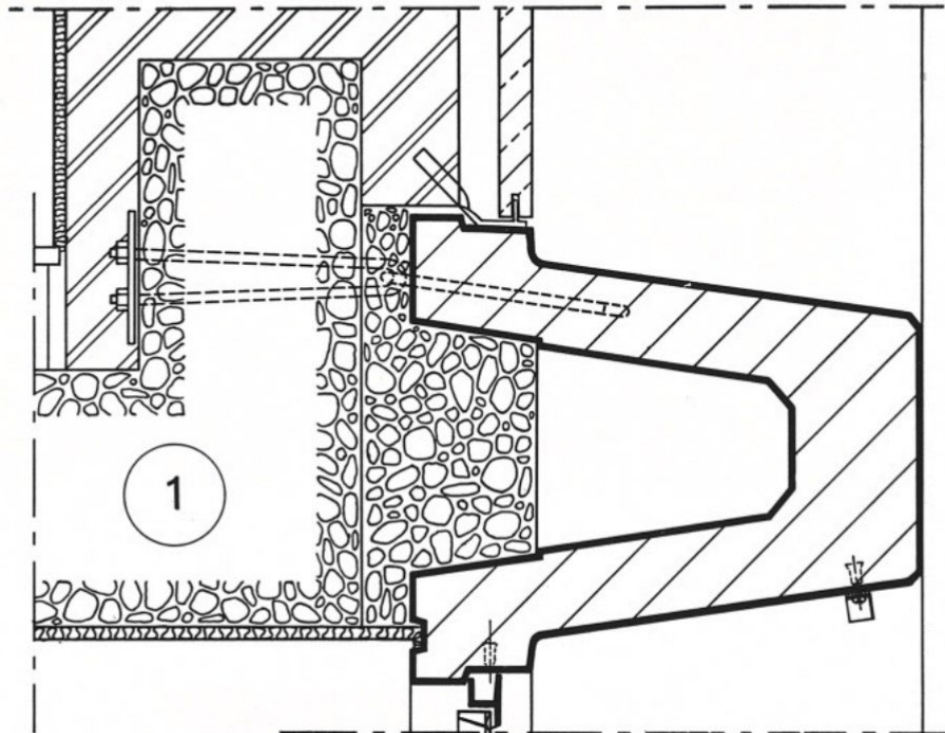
Vertical detail of the connection between the Schokbeton façade to the concrete skeleton, Schokbeton archives, 1958.
